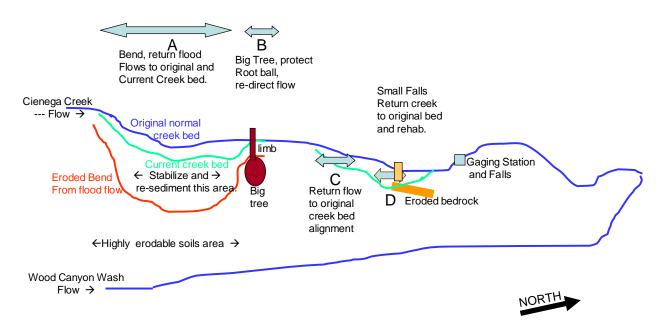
Plan View sketch of Project site in relation to Wood Canyon and bedrock falls, Cienega Creek, Arizona.
